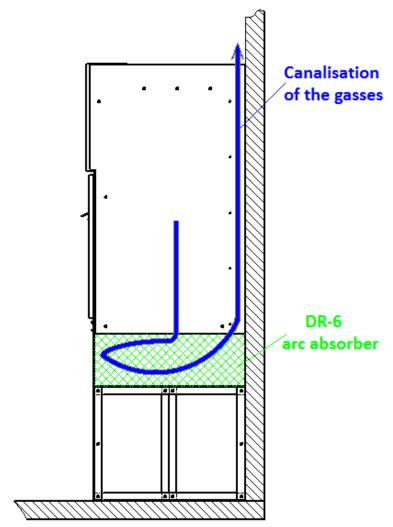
Gas escape route when placing the switchgear on a DR-6C cooling stand (Lateral view of installation)
